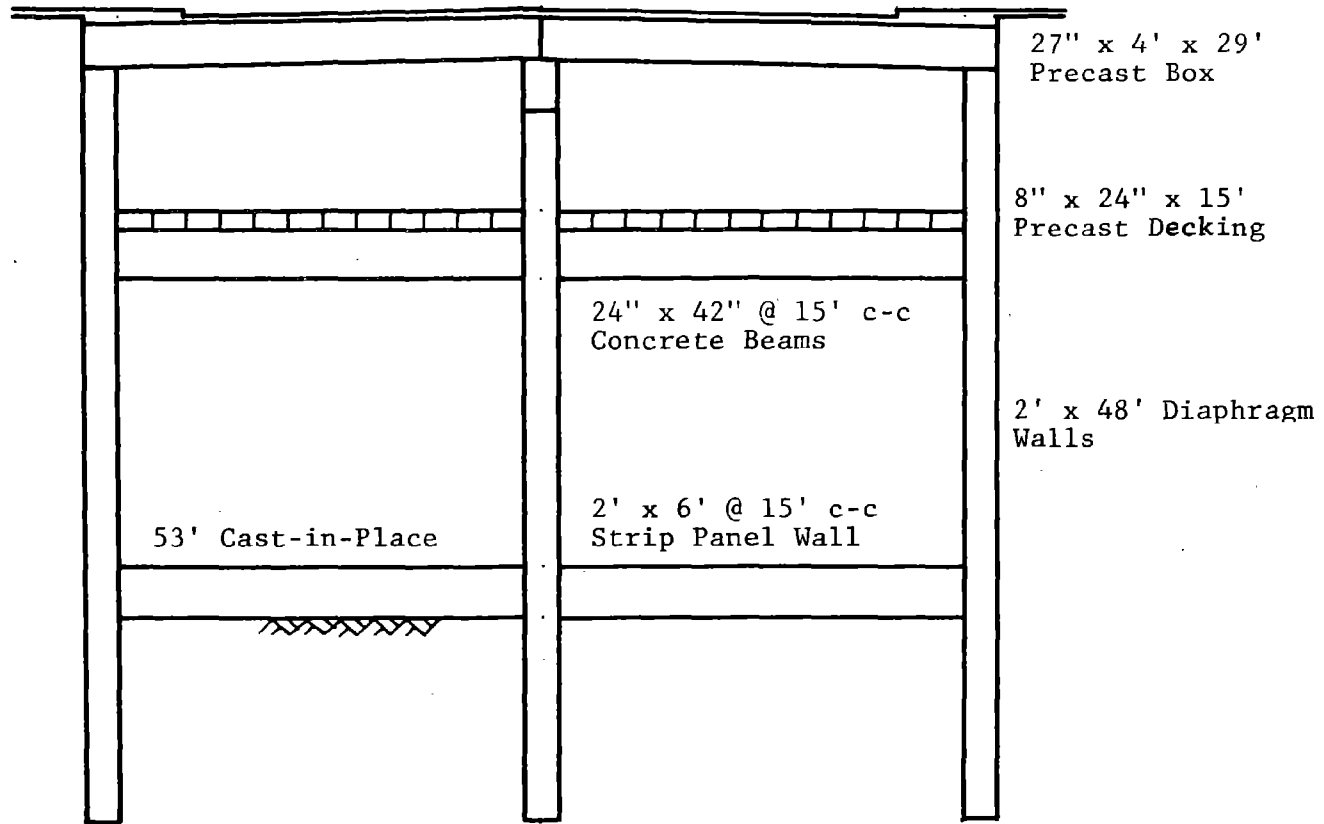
OPTION III - Utility Tunnel With Strip Panel Wall
